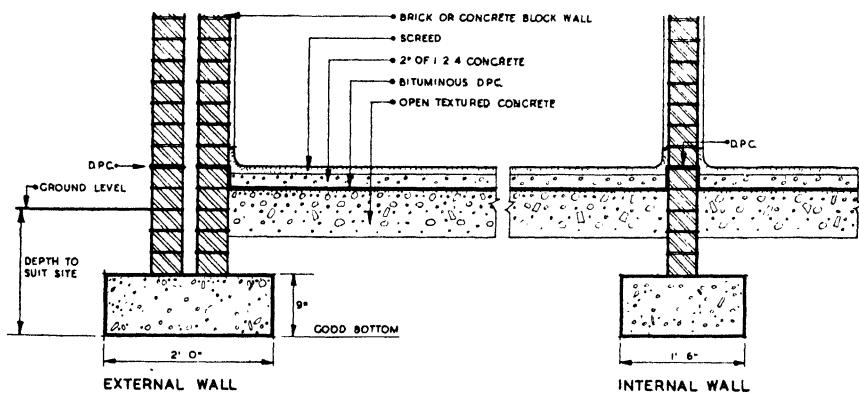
A.— ORDINARY CONCRETE GROUND FLOOR
